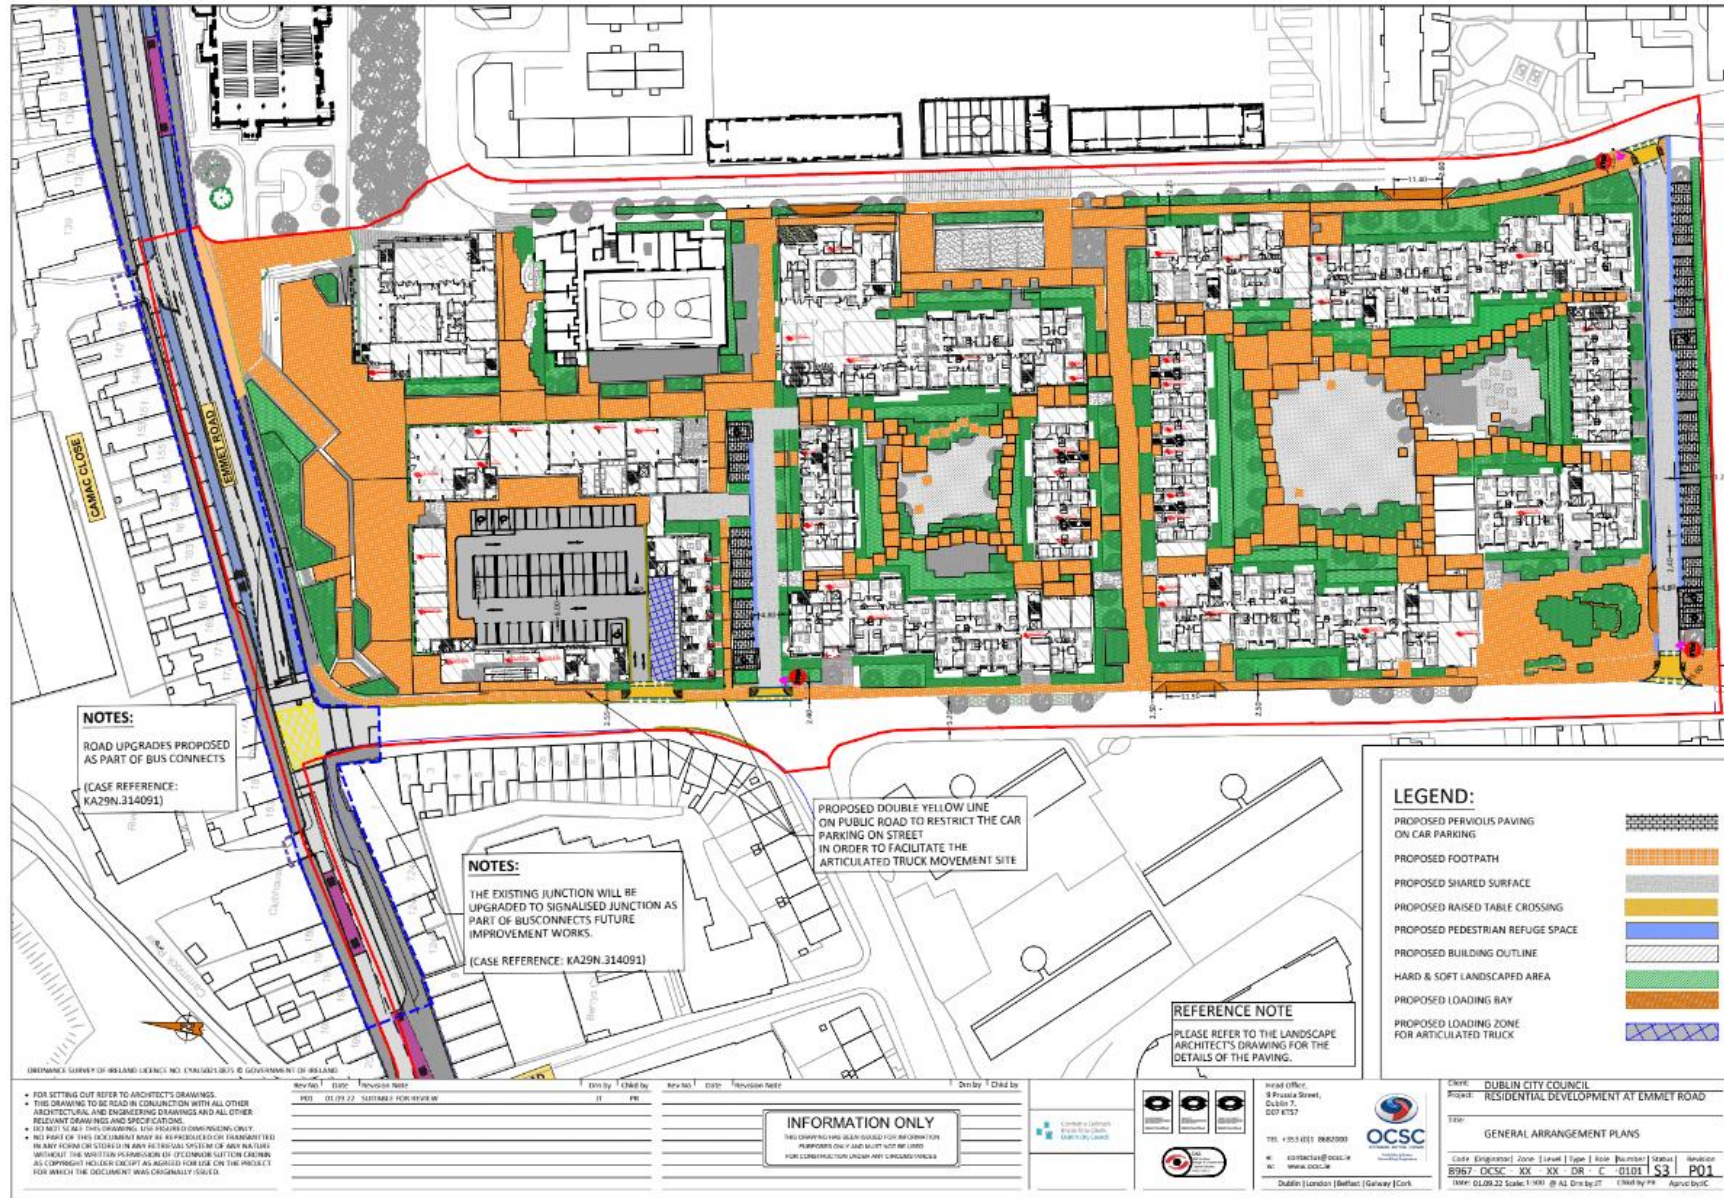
PROPOSED SITE LAYOUT (OCSC, DRG. NO. 0101 – S3 – P01).
